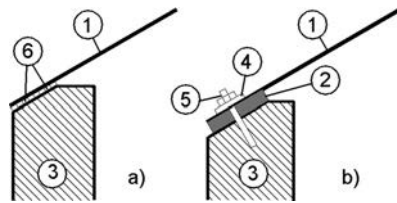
Joint of geomembrane with concrete plinth (a) with gluing; (b) with anchoring. (1) Geomembrane; (2) layer of elastic material; (3) concrete plinth; (4) steel plate; (5) bolt; (6) glued joint.
